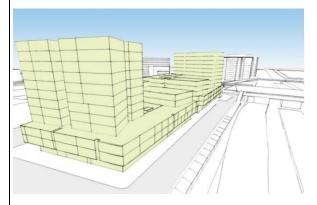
Indicative 3D massing looking southeast from Geeves Avenue adjacent to the railway station
